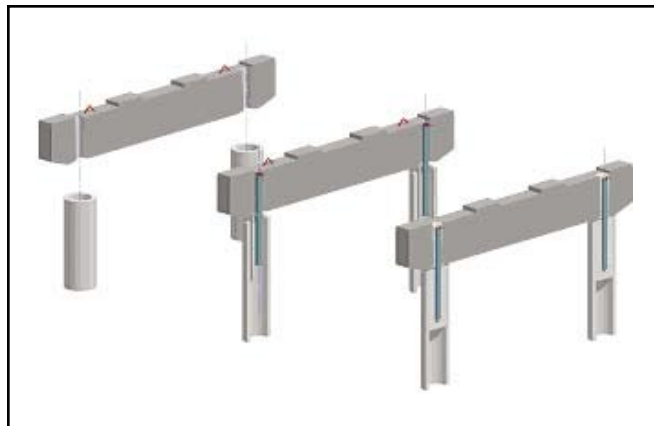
Innovative pile-to-precast concrete bent cap connection using steel pipe.
